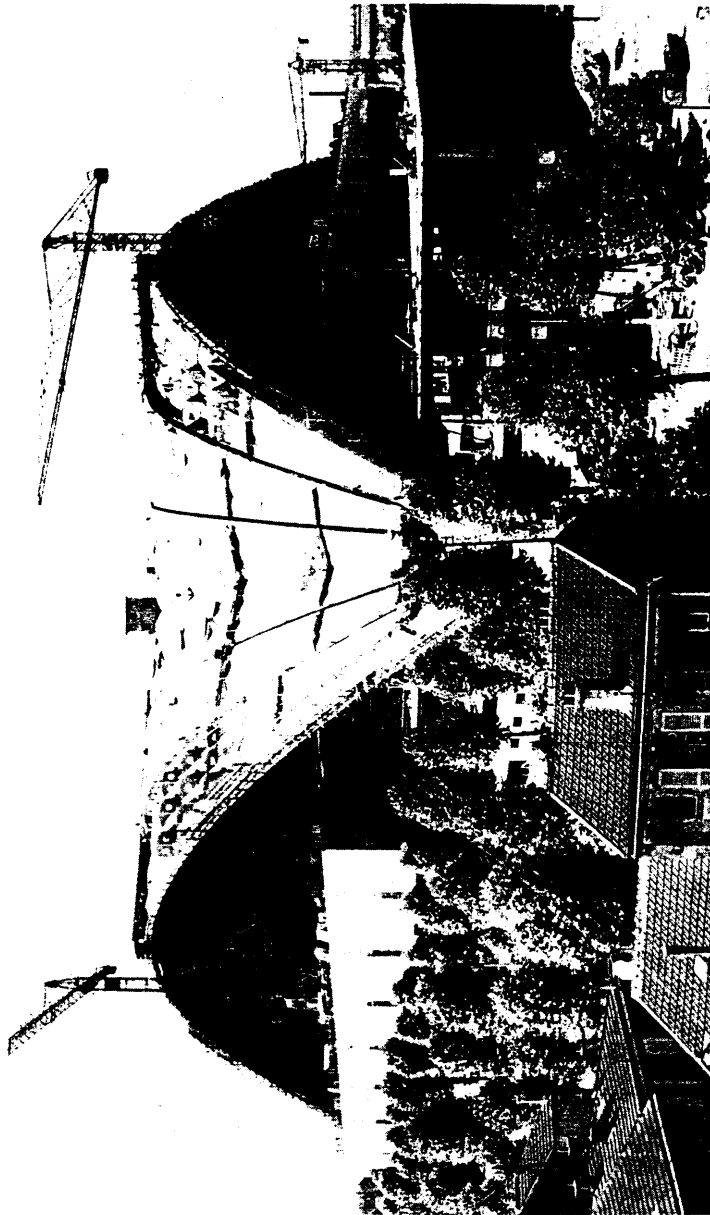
THE SPACES BETWEEN CONSTRUCTION SECTIONS WERE FILLED WITH CAST-IN-PLACE CONCRETE SEVERAL MONTHS AFTER DECENTERING TO PERMIT MOST OF THE CREEP AND SHRINKAGE TO TAKE PLACE. FINALLY THE STRUCTURE IS COMPLETELY MONOLITHIC.
